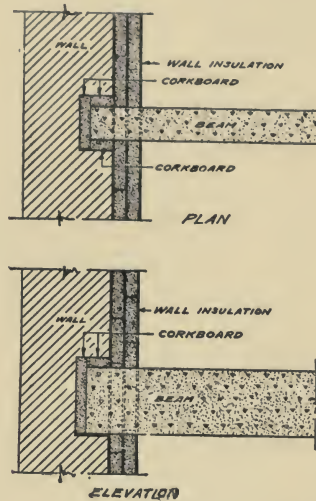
Typical first class wall insulation [note method used in insulation at the floor level]
